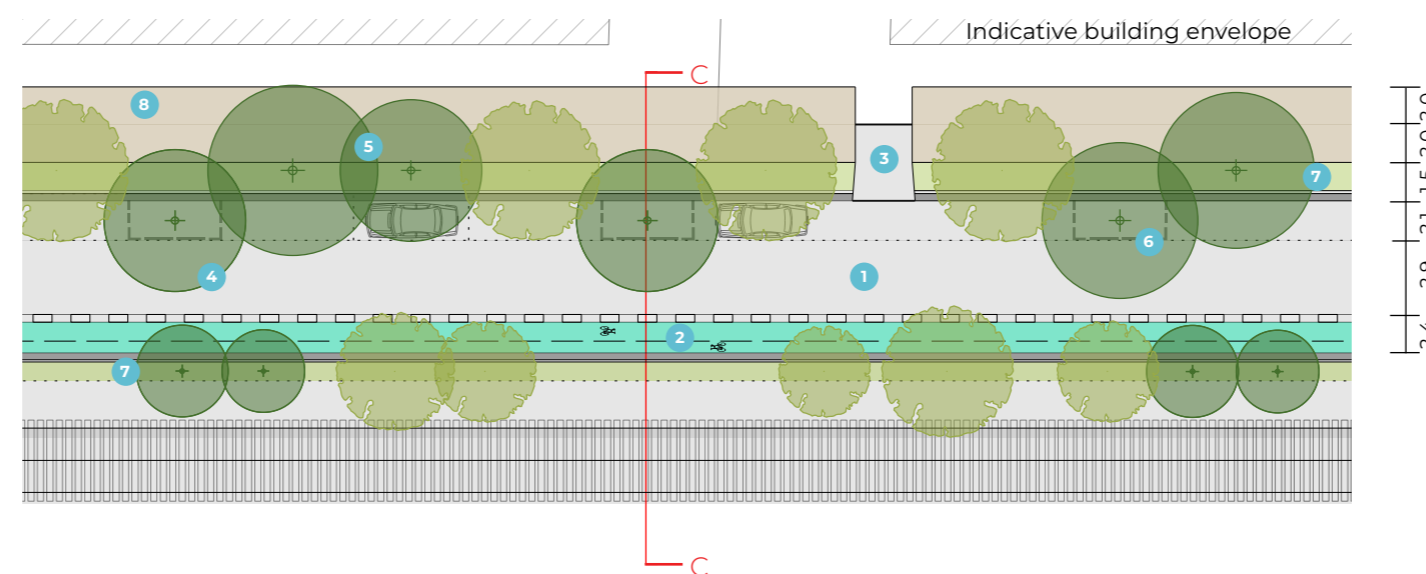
Typical Plan of Active Transport Street. 1:400 @ A3.
